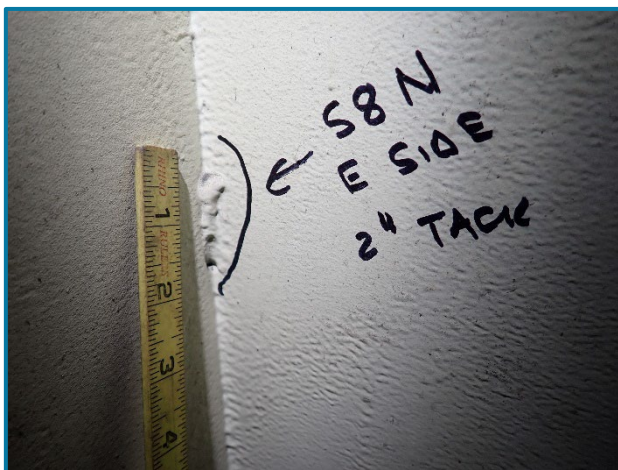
Typical tack weld between the interior transverse stiffener and web plate (looking northwest inside of the River Pier Cap).
